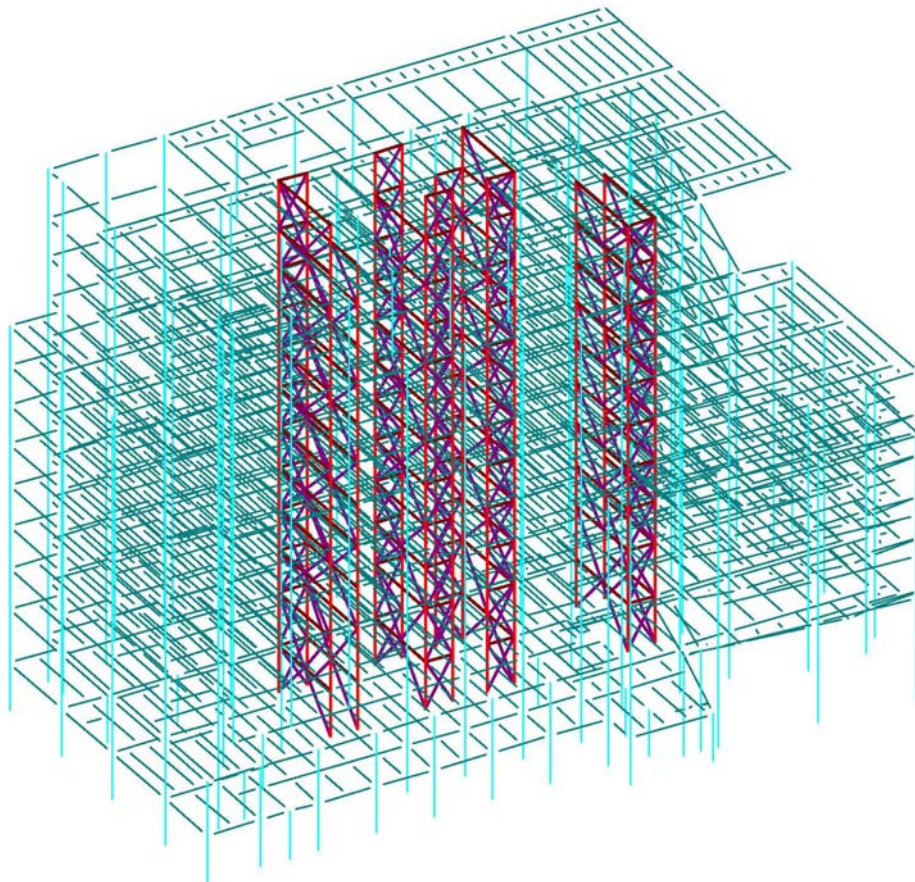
RAM Model of Steel Gravity Framing and Braced Frames
